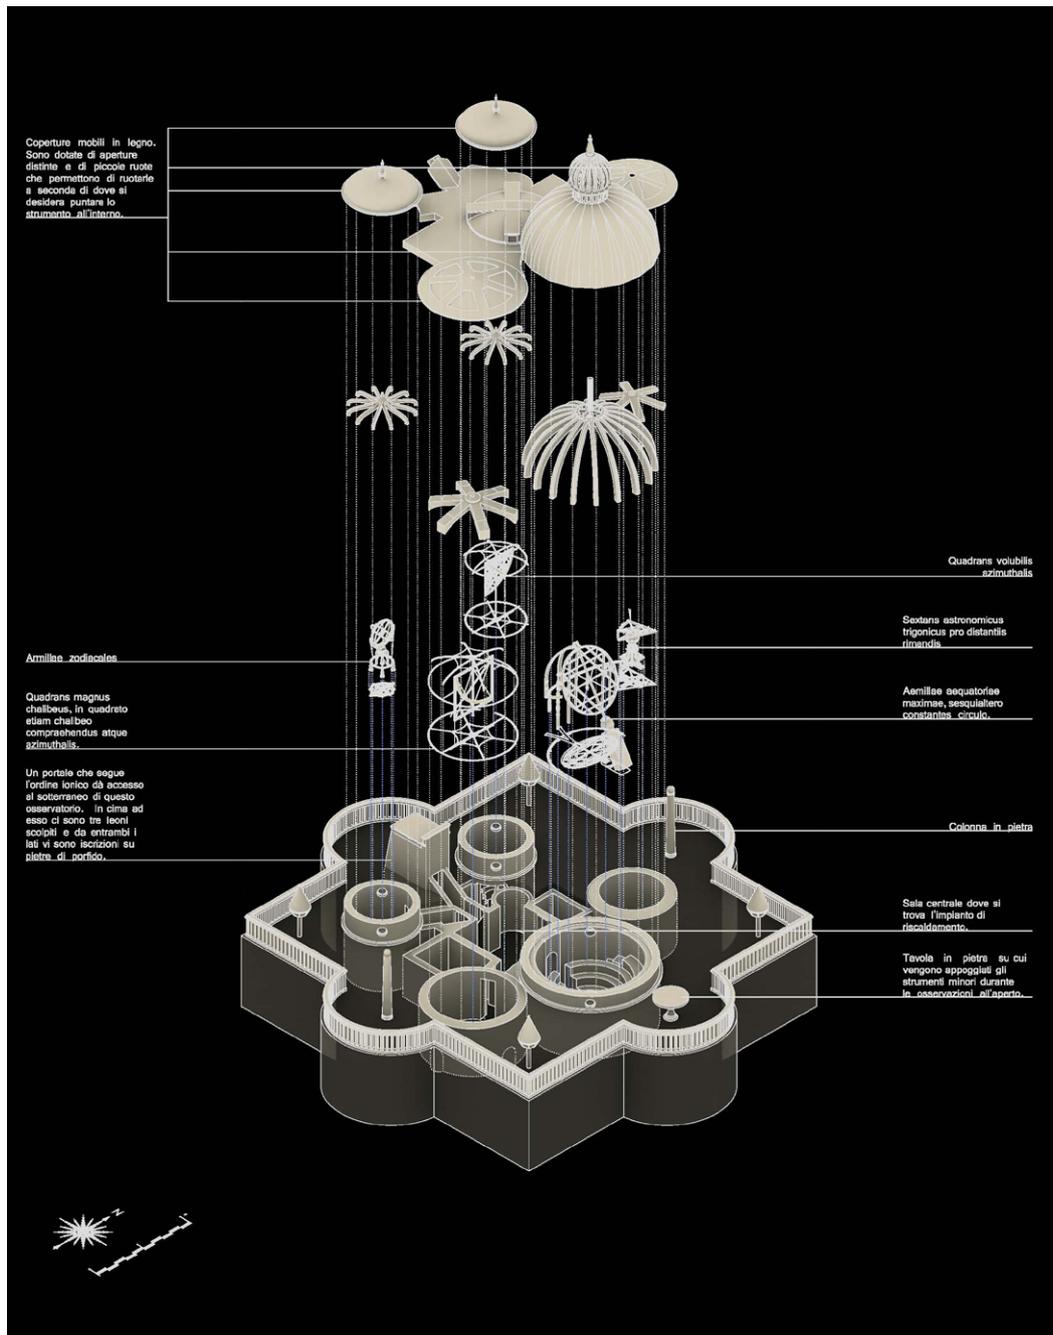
Axonometric exploded view of the Sjerneborg Observatory. 3D model: Monica Enzo.
